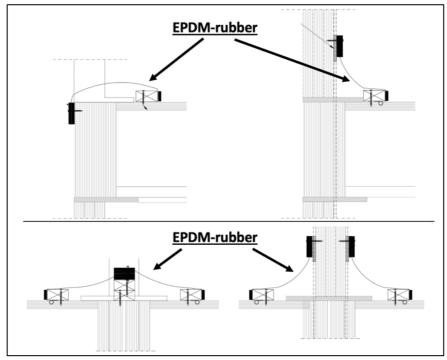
Moisture control work drawings for protecting connection points, end grains and structural joints with EPDM-rubber strips. Top image shows protections for load bearing outer walls and lower image for load bearing inner walls.
